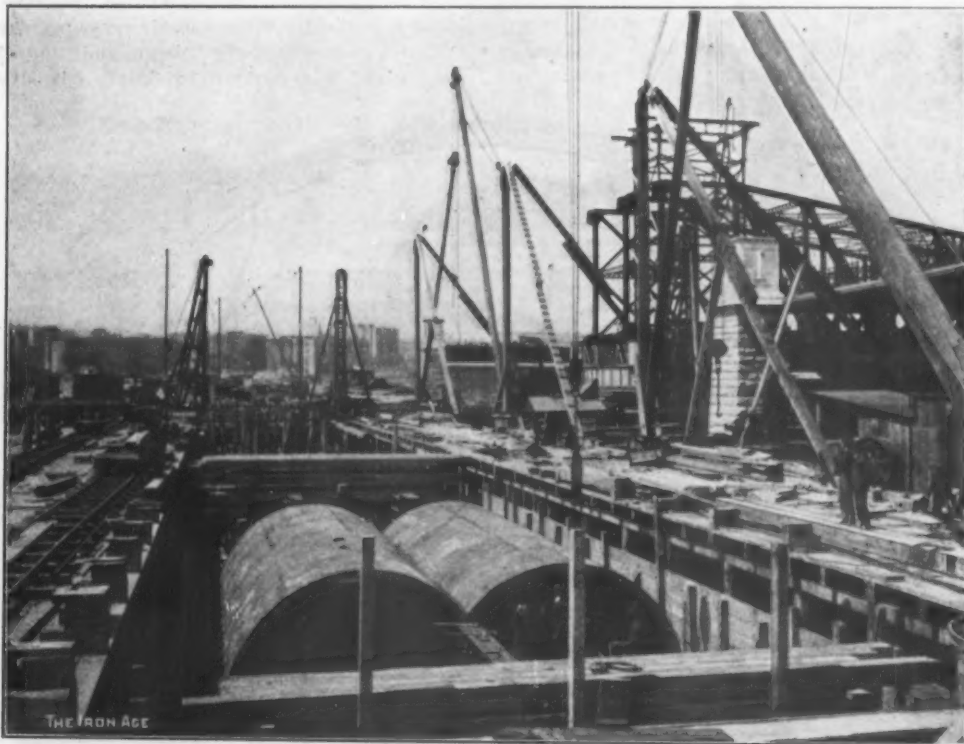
Constructing the Twin Tunnels Under the Harlem River.
